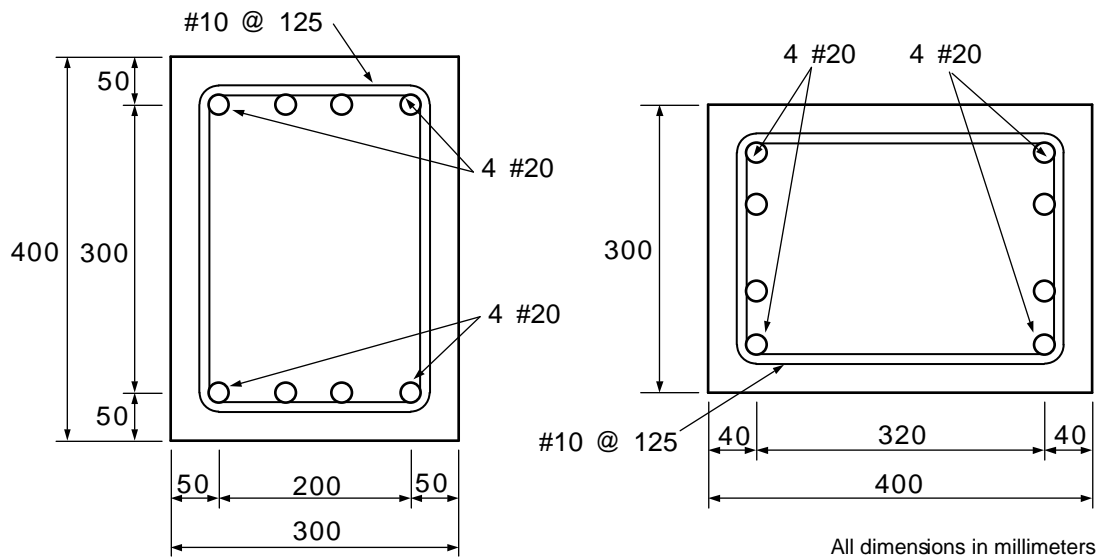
Beam and Column Geometry and Reinforcement (adapted from 4-10)
